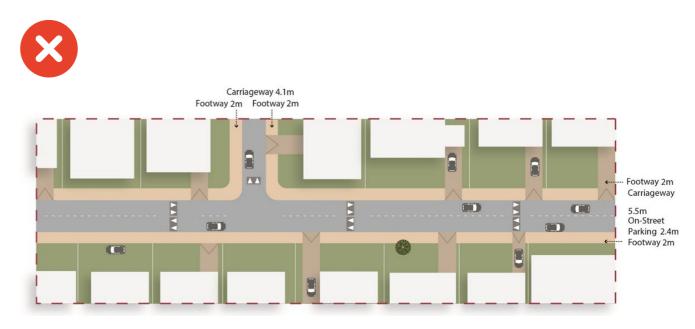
Street Typology Plan for a Poorly Designed Residential Link Street in an Urban Context
